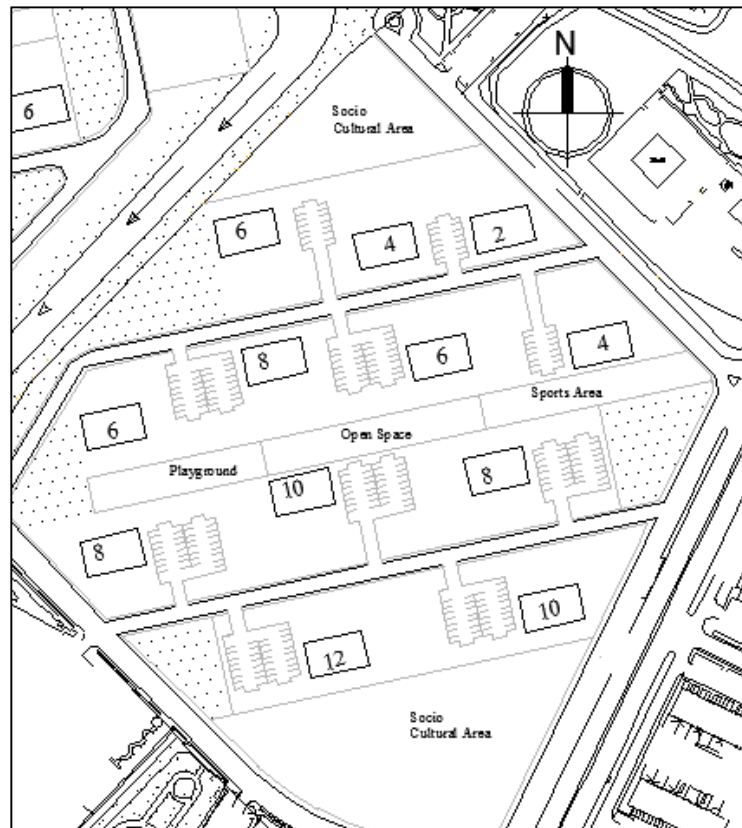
Site plan of solar envelope based alternative (Section 3).
